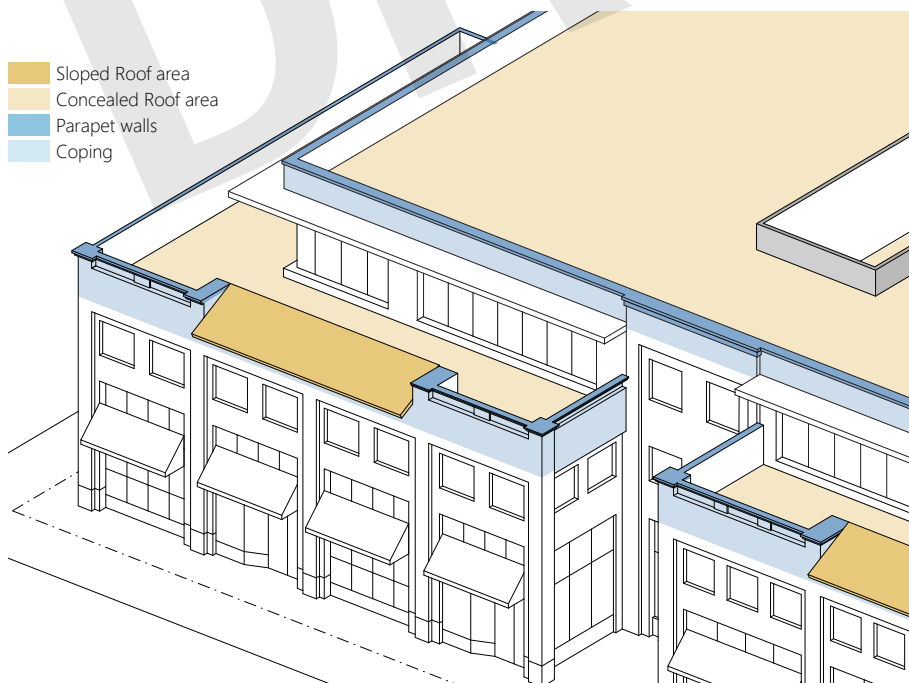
The tops of the building can be designed to provide interesting profiles while reinforcing building massing and style.
